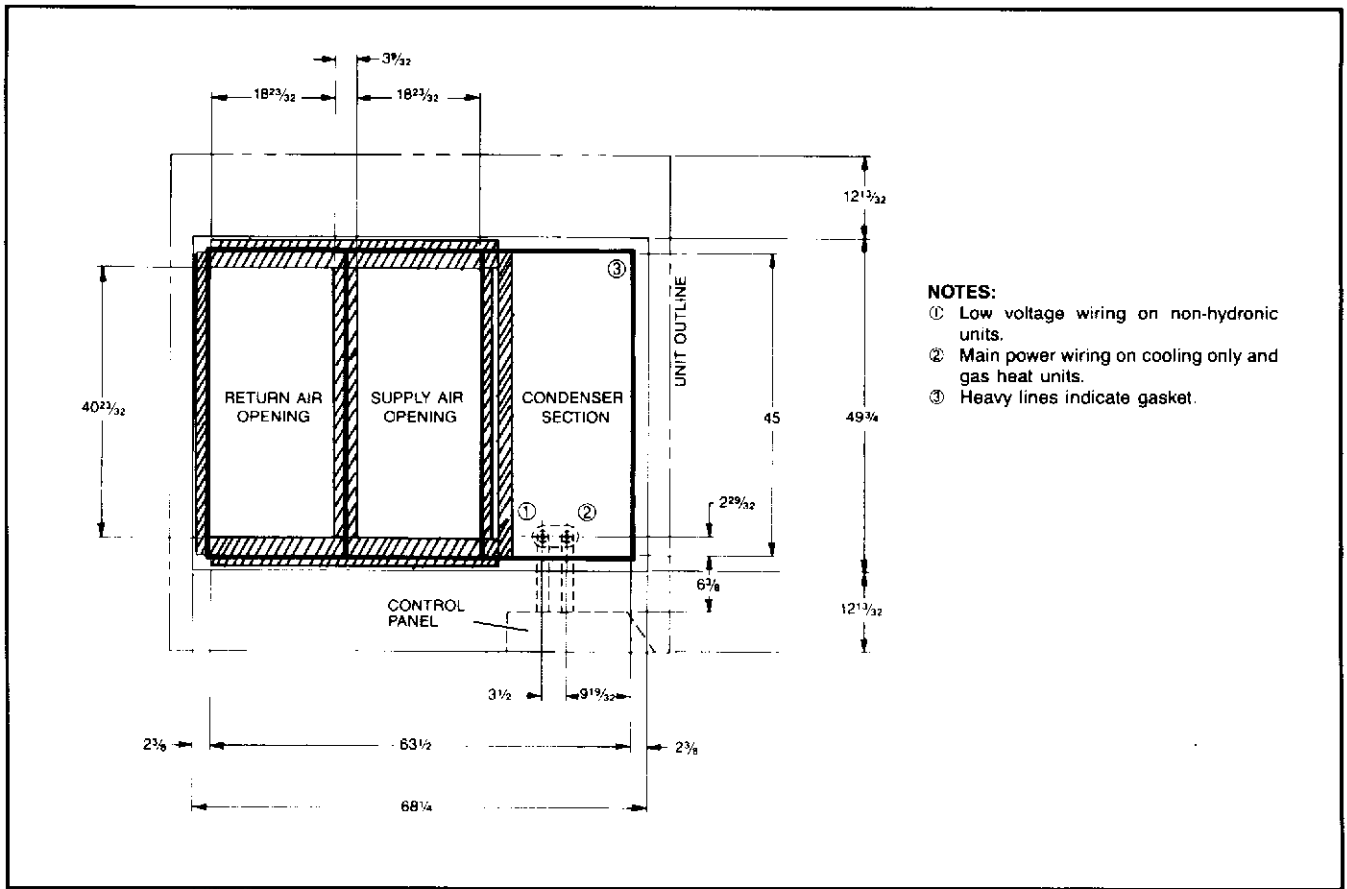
Cantilever Curb and Duct Connection Frame Kit (Side Overhang)
